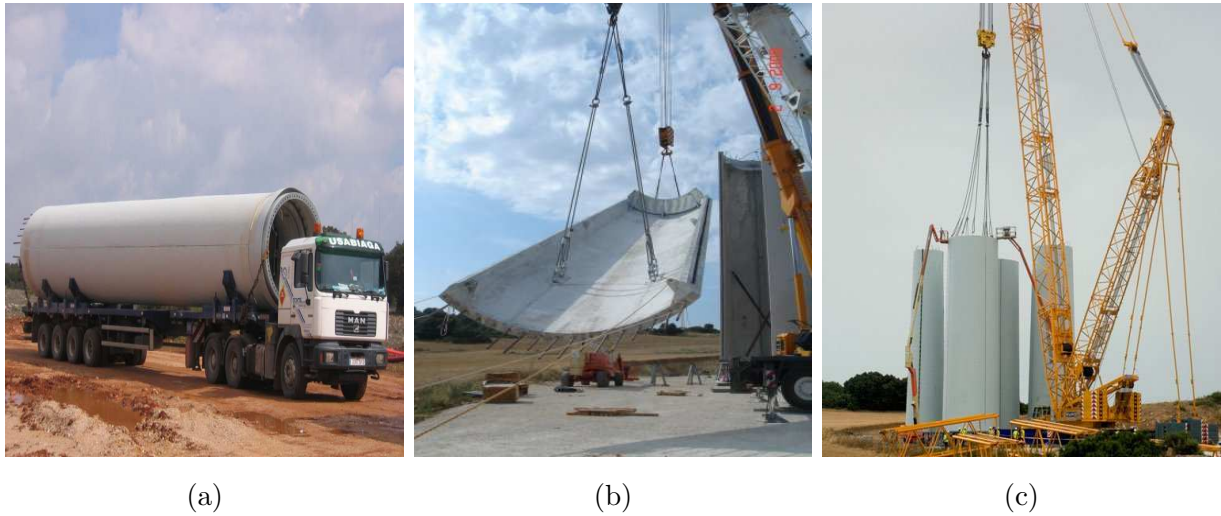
Inneo towers, taken from [18]; (a) transportation of precast elements; (b) erection of precast elements; and (c) the first assembly phase of a concrete tower
